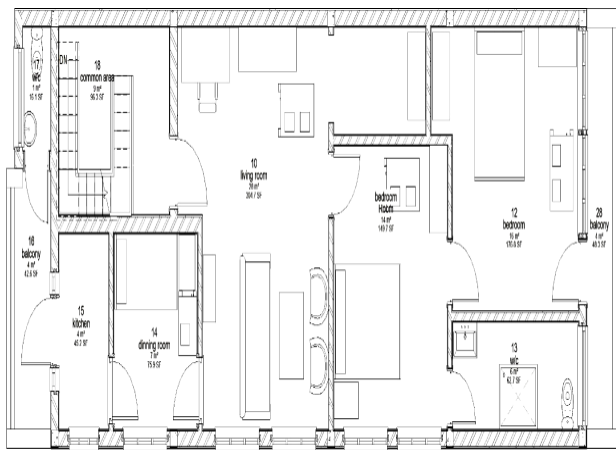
(b) Plan of Re-Designed Case House (First & Second Floor)
